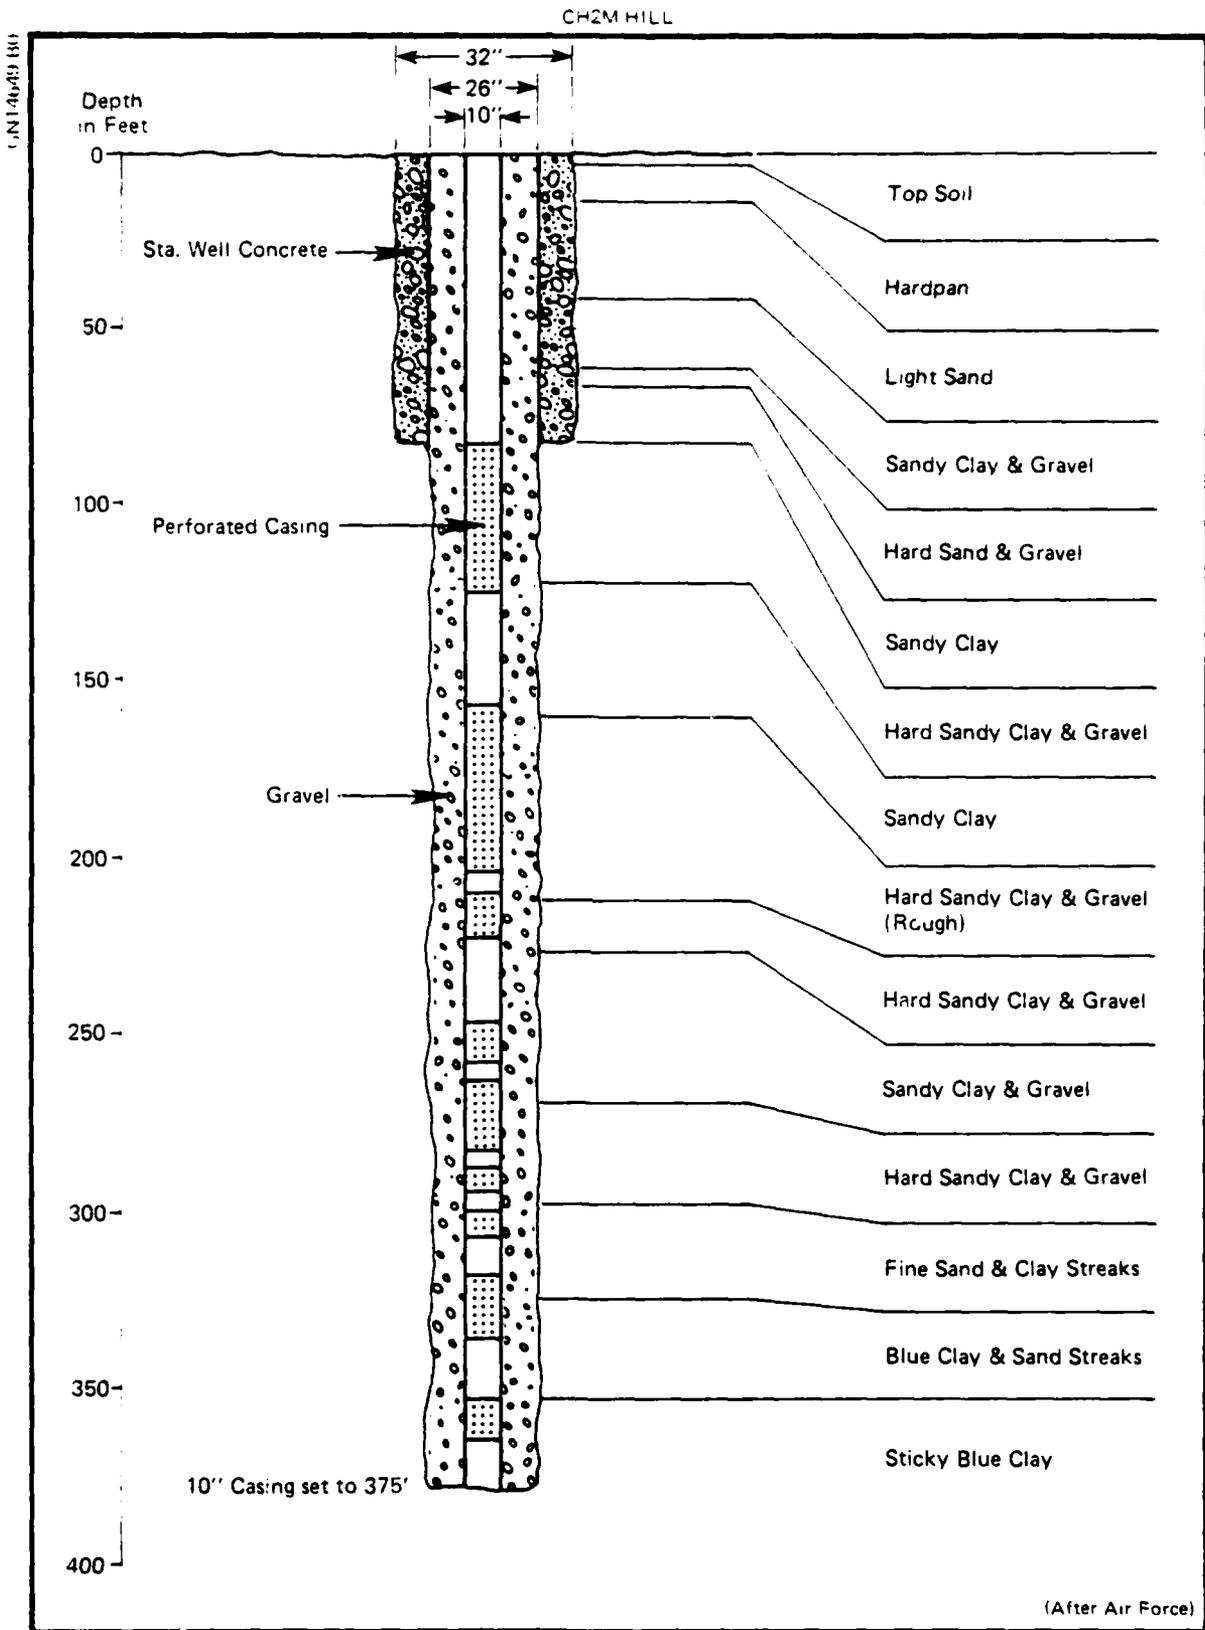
Log and well construction details of Well No. 1 at the Lincoln site.
